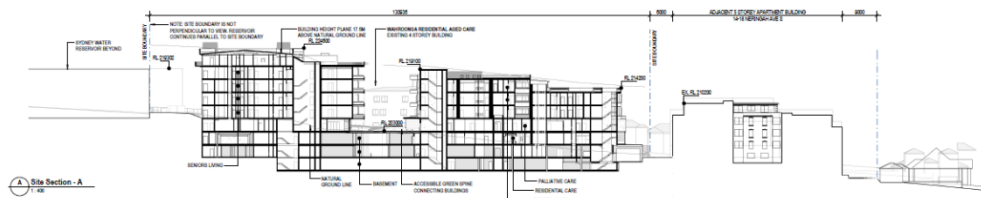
Proposed site section A. (Source: Bickerton Masters Architects)
